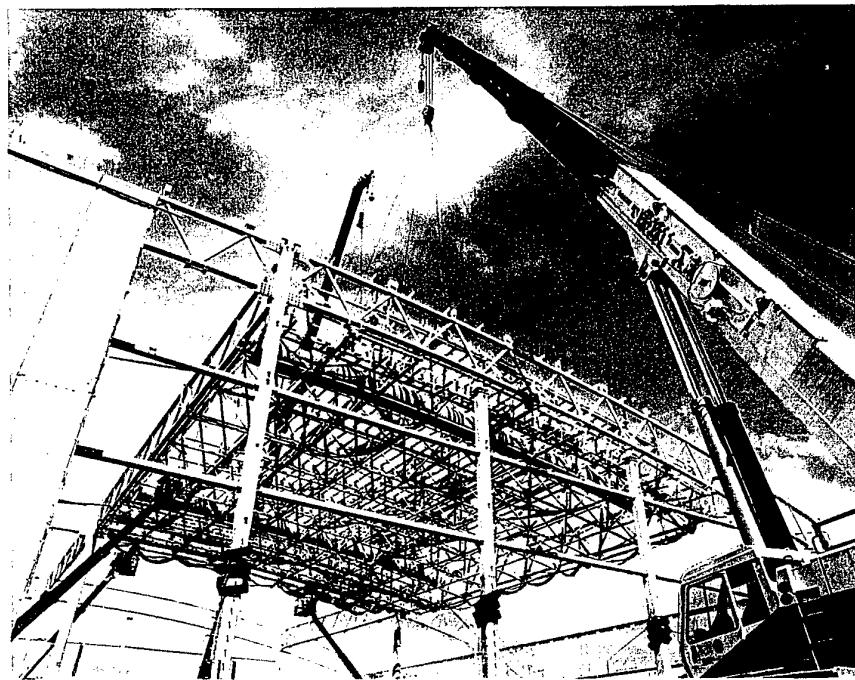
Lift-up the CFRP Space Frame of the Mishima city pool
